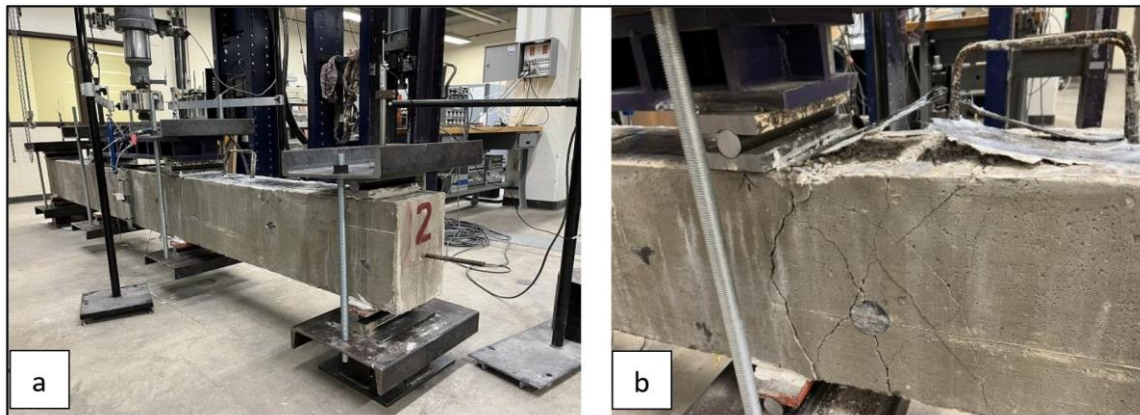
Specimen No.2. (a) before testing. (b) at failure
